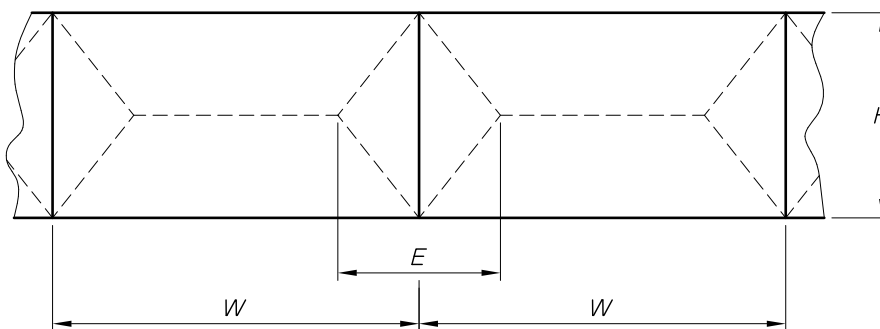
ELEVATION VIEW OF GLAZING PANELS WIDER THAN THEIR HEIGHT
